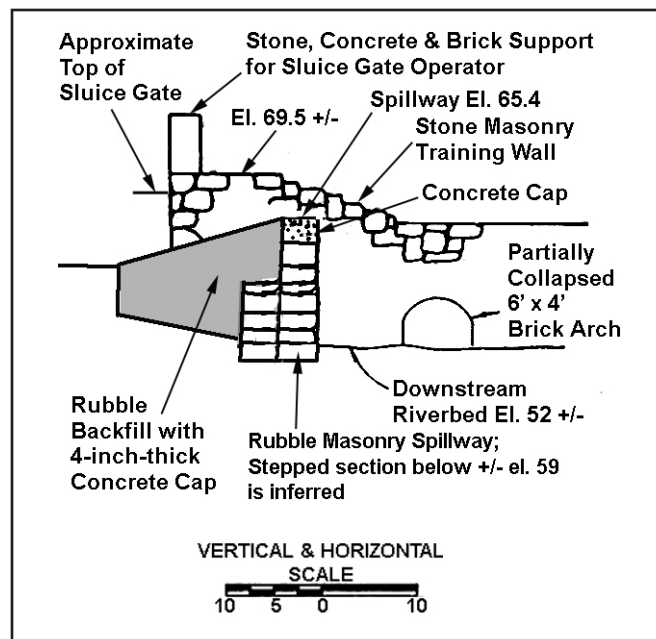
Schematic dam section to east at east end of dam. Base images: Roald Haestad, Inc. 1981, with elevations NAVD 1988 and details 2018 and 2019.
